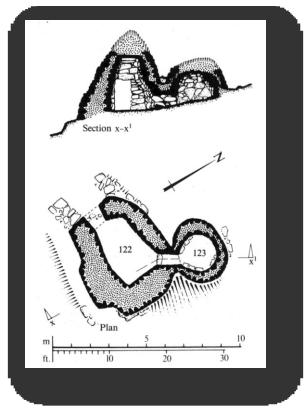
Plan and sectional elevation of Structure 122 and 123 (RCAHMS). Inked drawing DP 082864 © RCAHMS
